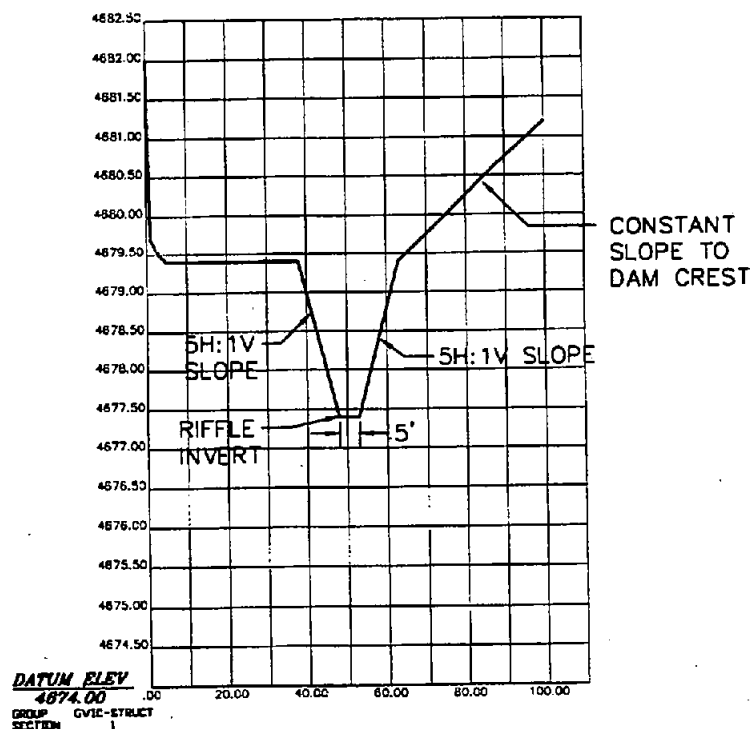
Riffle section details (FLO Engineering, Inc., 1997).
